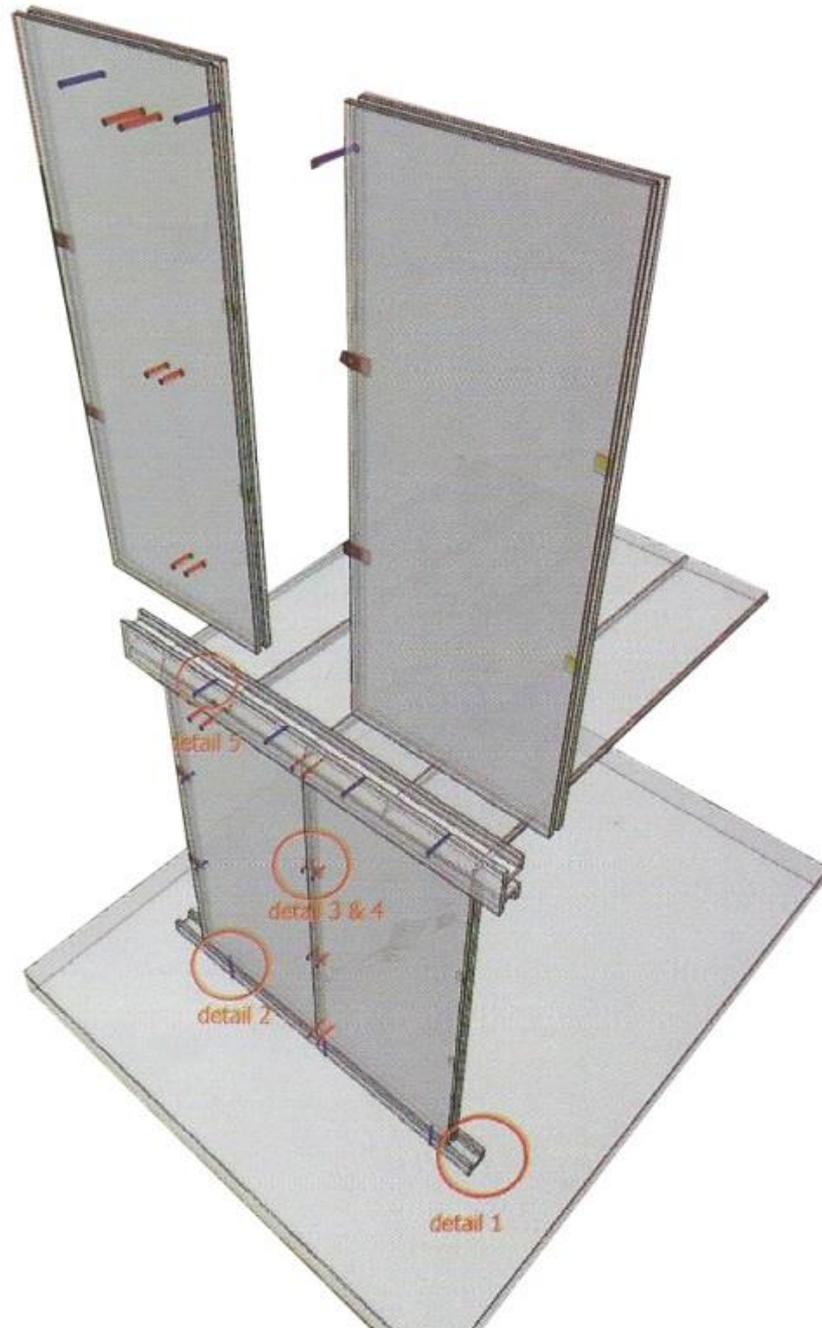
Components Installing Details (Arabian Construction House, 2016)
